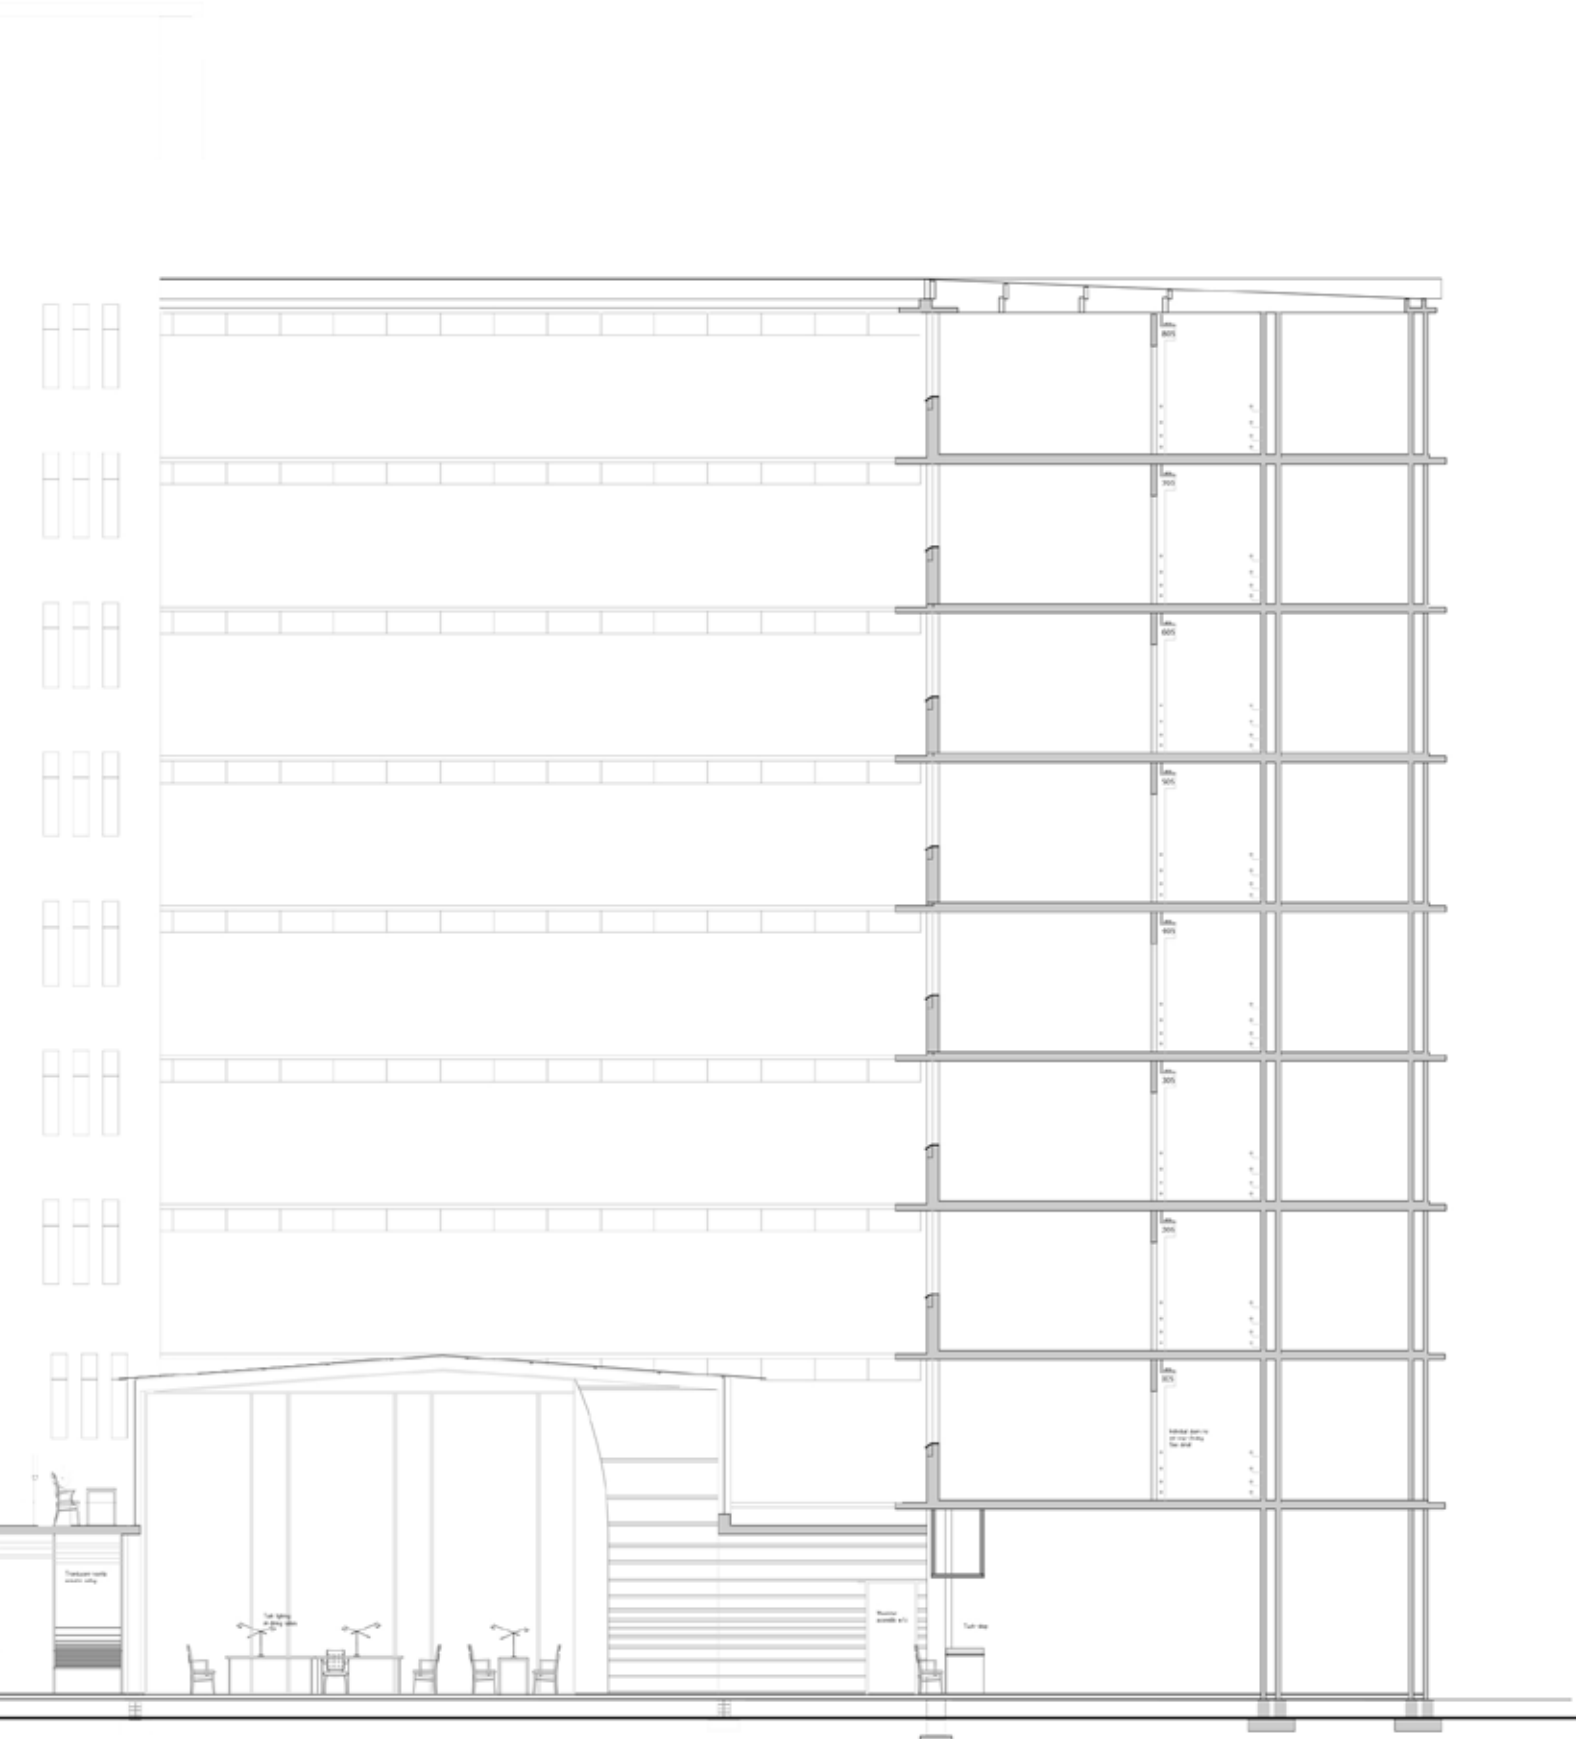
Concept C, conceptual altering of facade (Author,2013)
